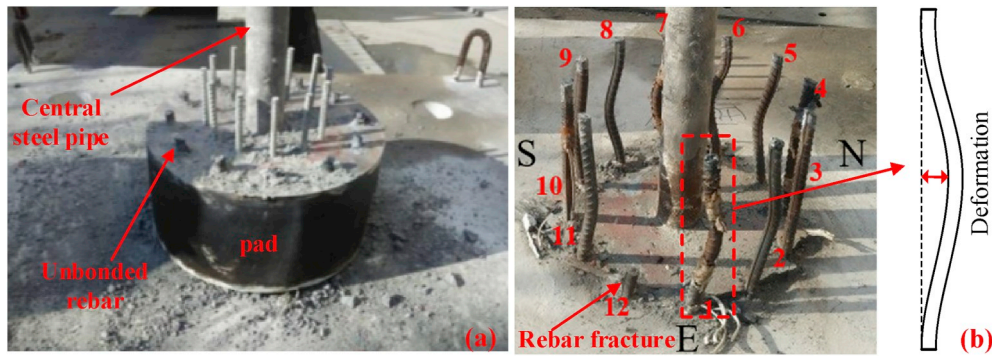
Unbonded longitudinal steel bars in the GCP-M specimen: (a) laminated rubber pad cut from the column; (b) buckling modes of the rebar after the tests.
